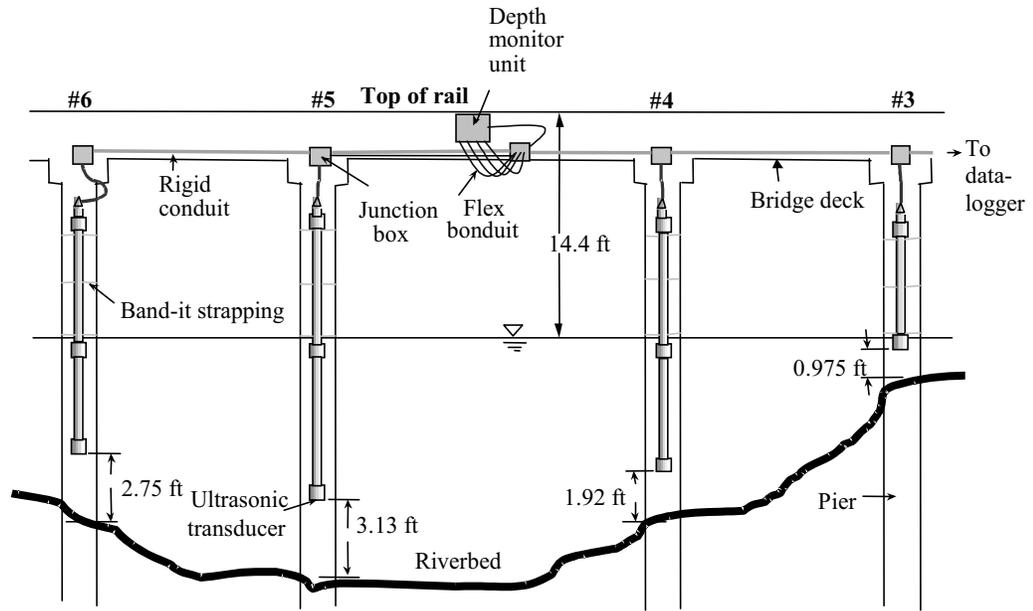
Elevation of the proposed installation viewed from upstream.
